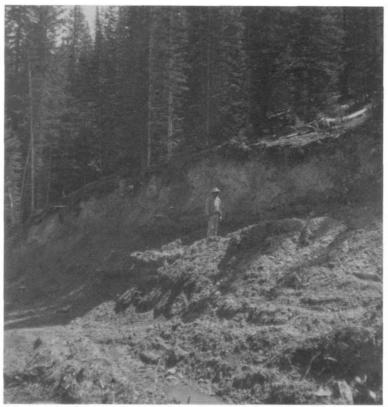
Slump in cut for drill road at about Sta. 124+50. After cut was made slumping apparently occurred in several episodes.
